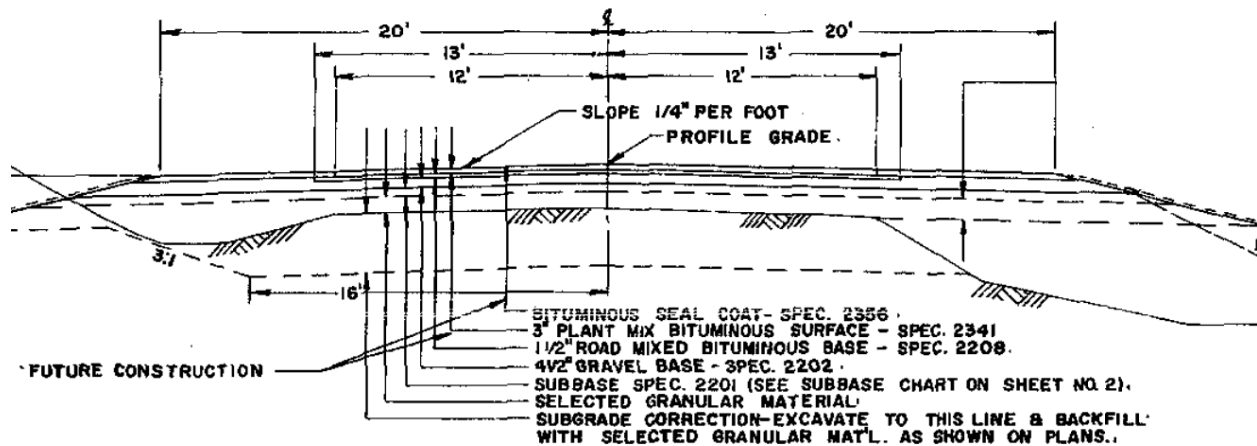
TH 71 mainline typical section (1959 construction plan)
